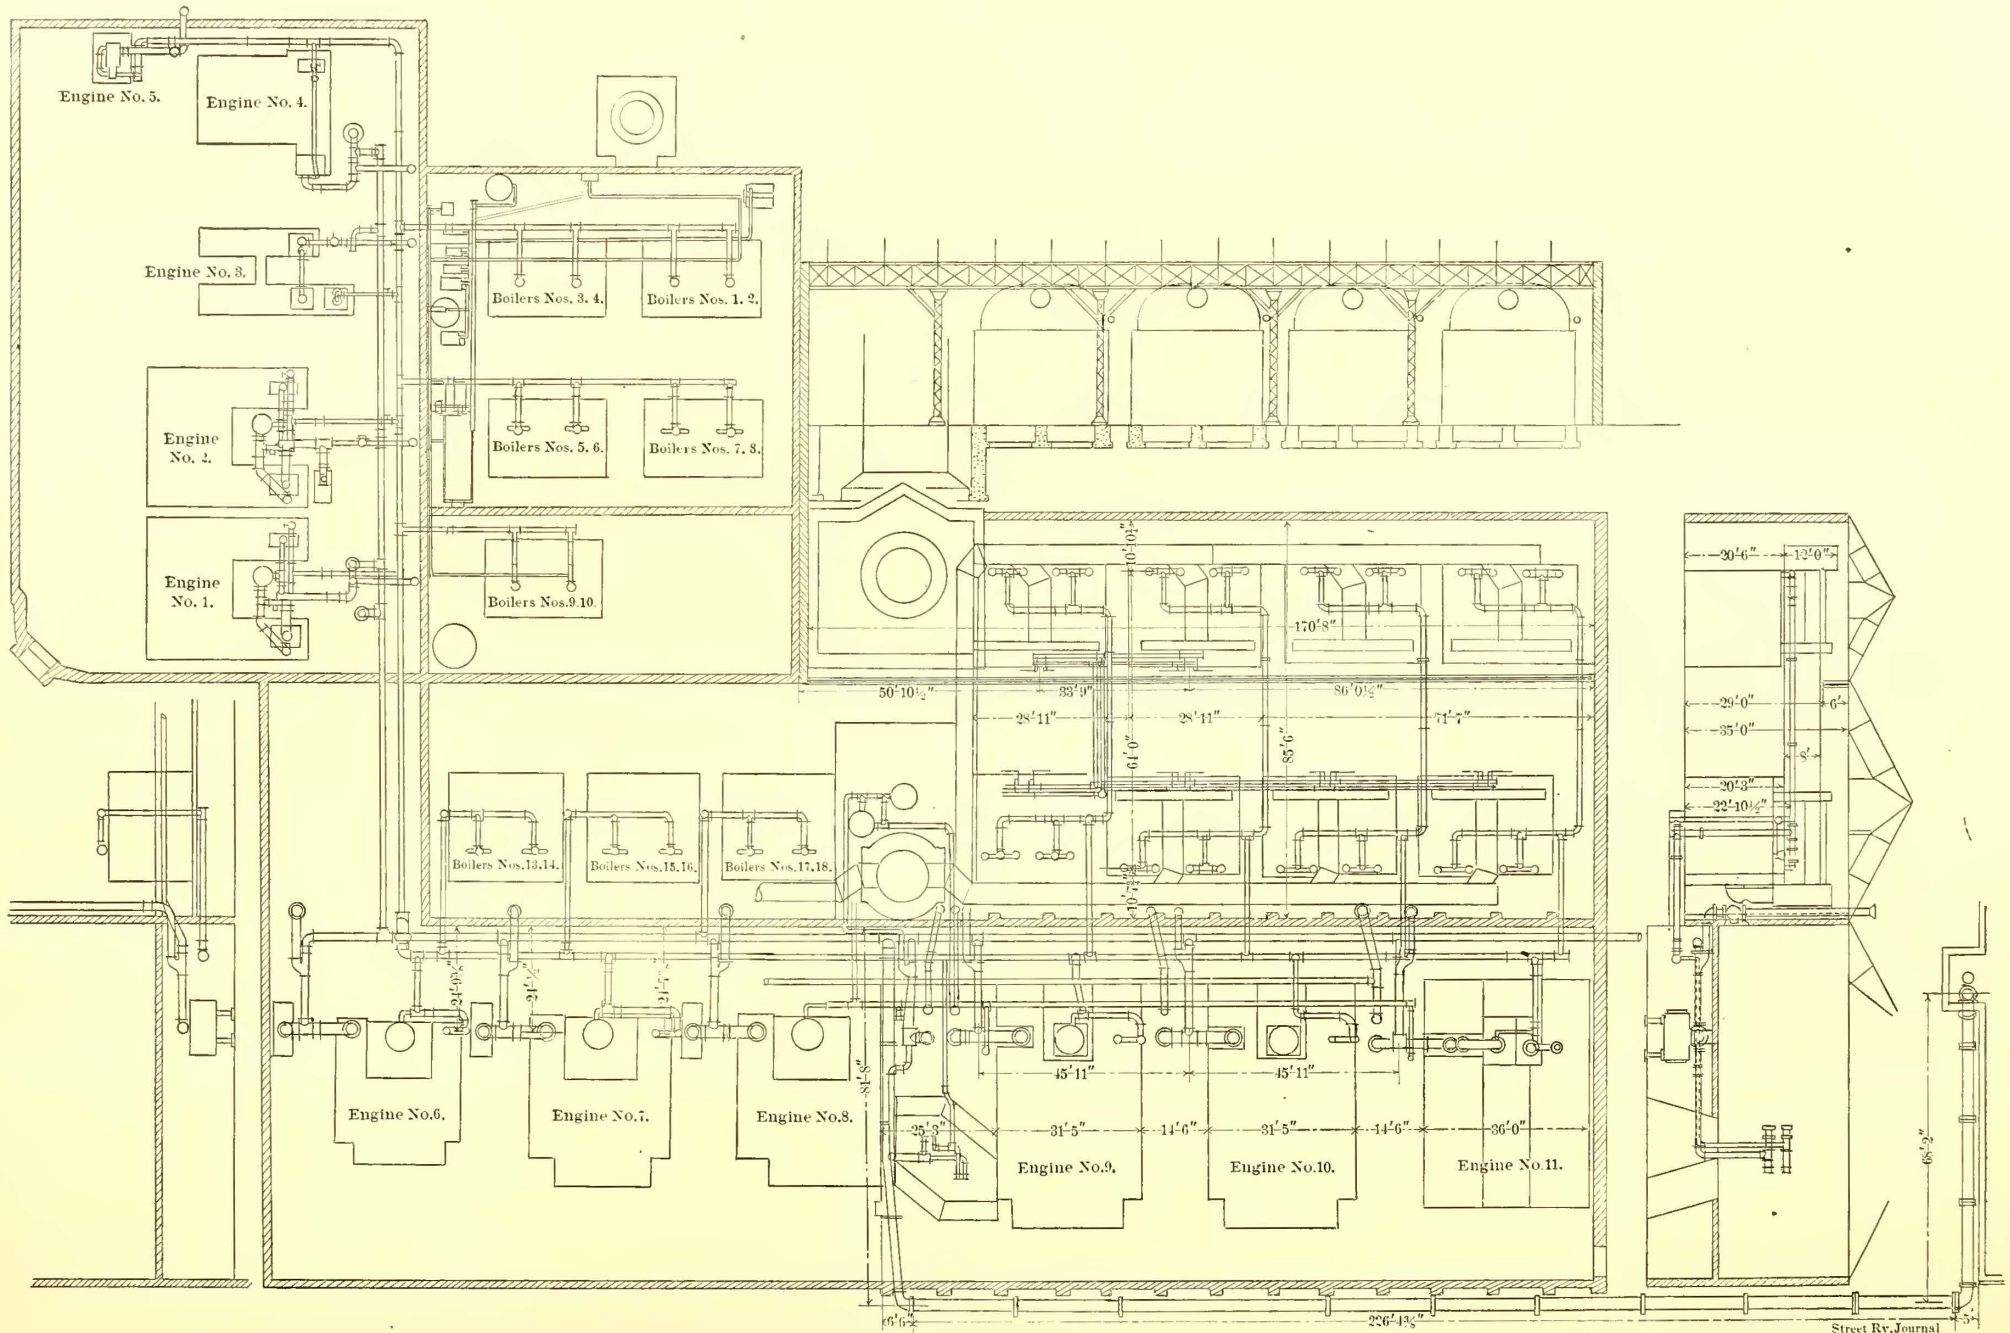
PLAN AND SECTIONS OF POWER STATION, SHOWING OLD AND NEW PARTS
